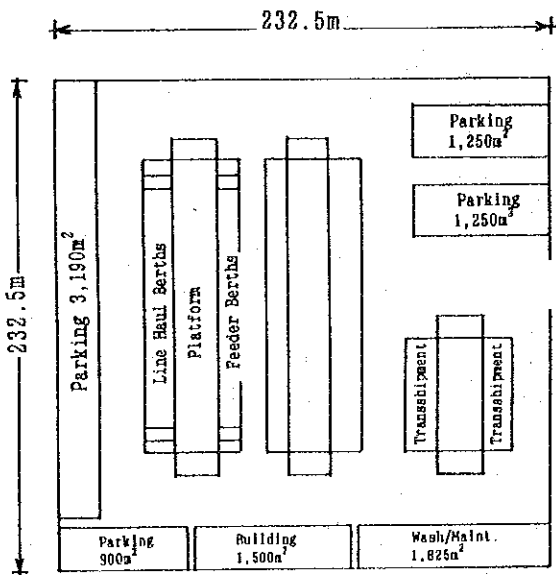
Mansoura Truck Terminal Schematic Layout
